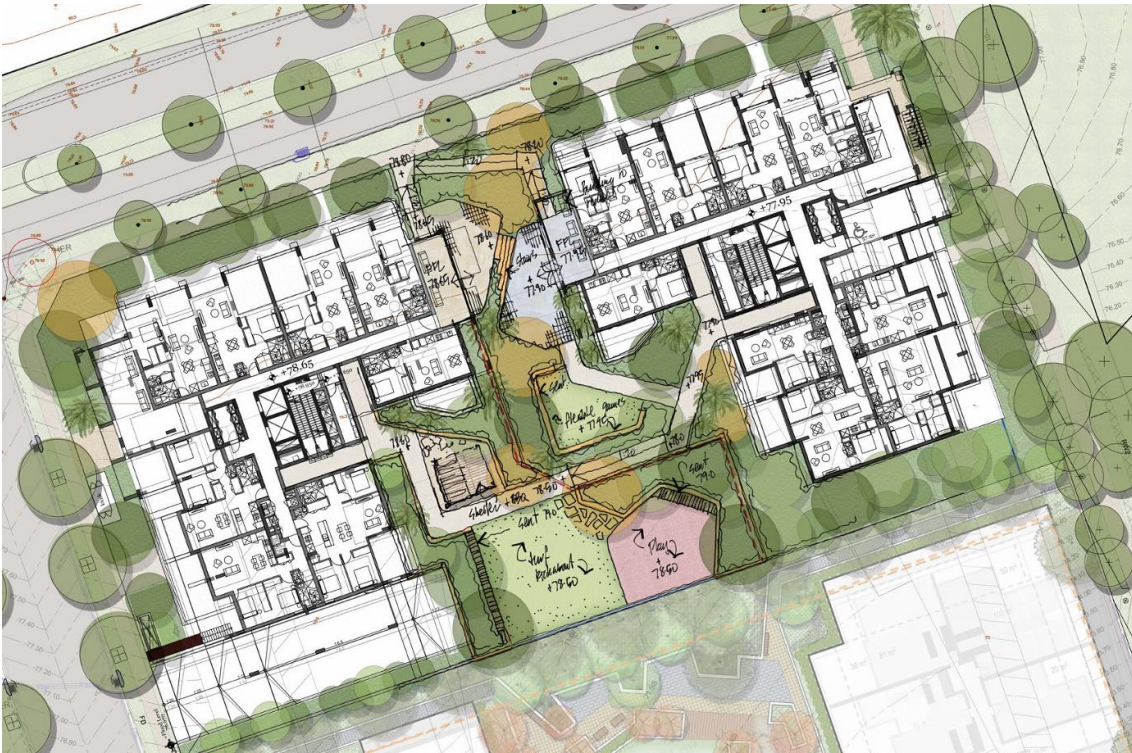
Landscape plan concept (Source: TaylorBrammer)
